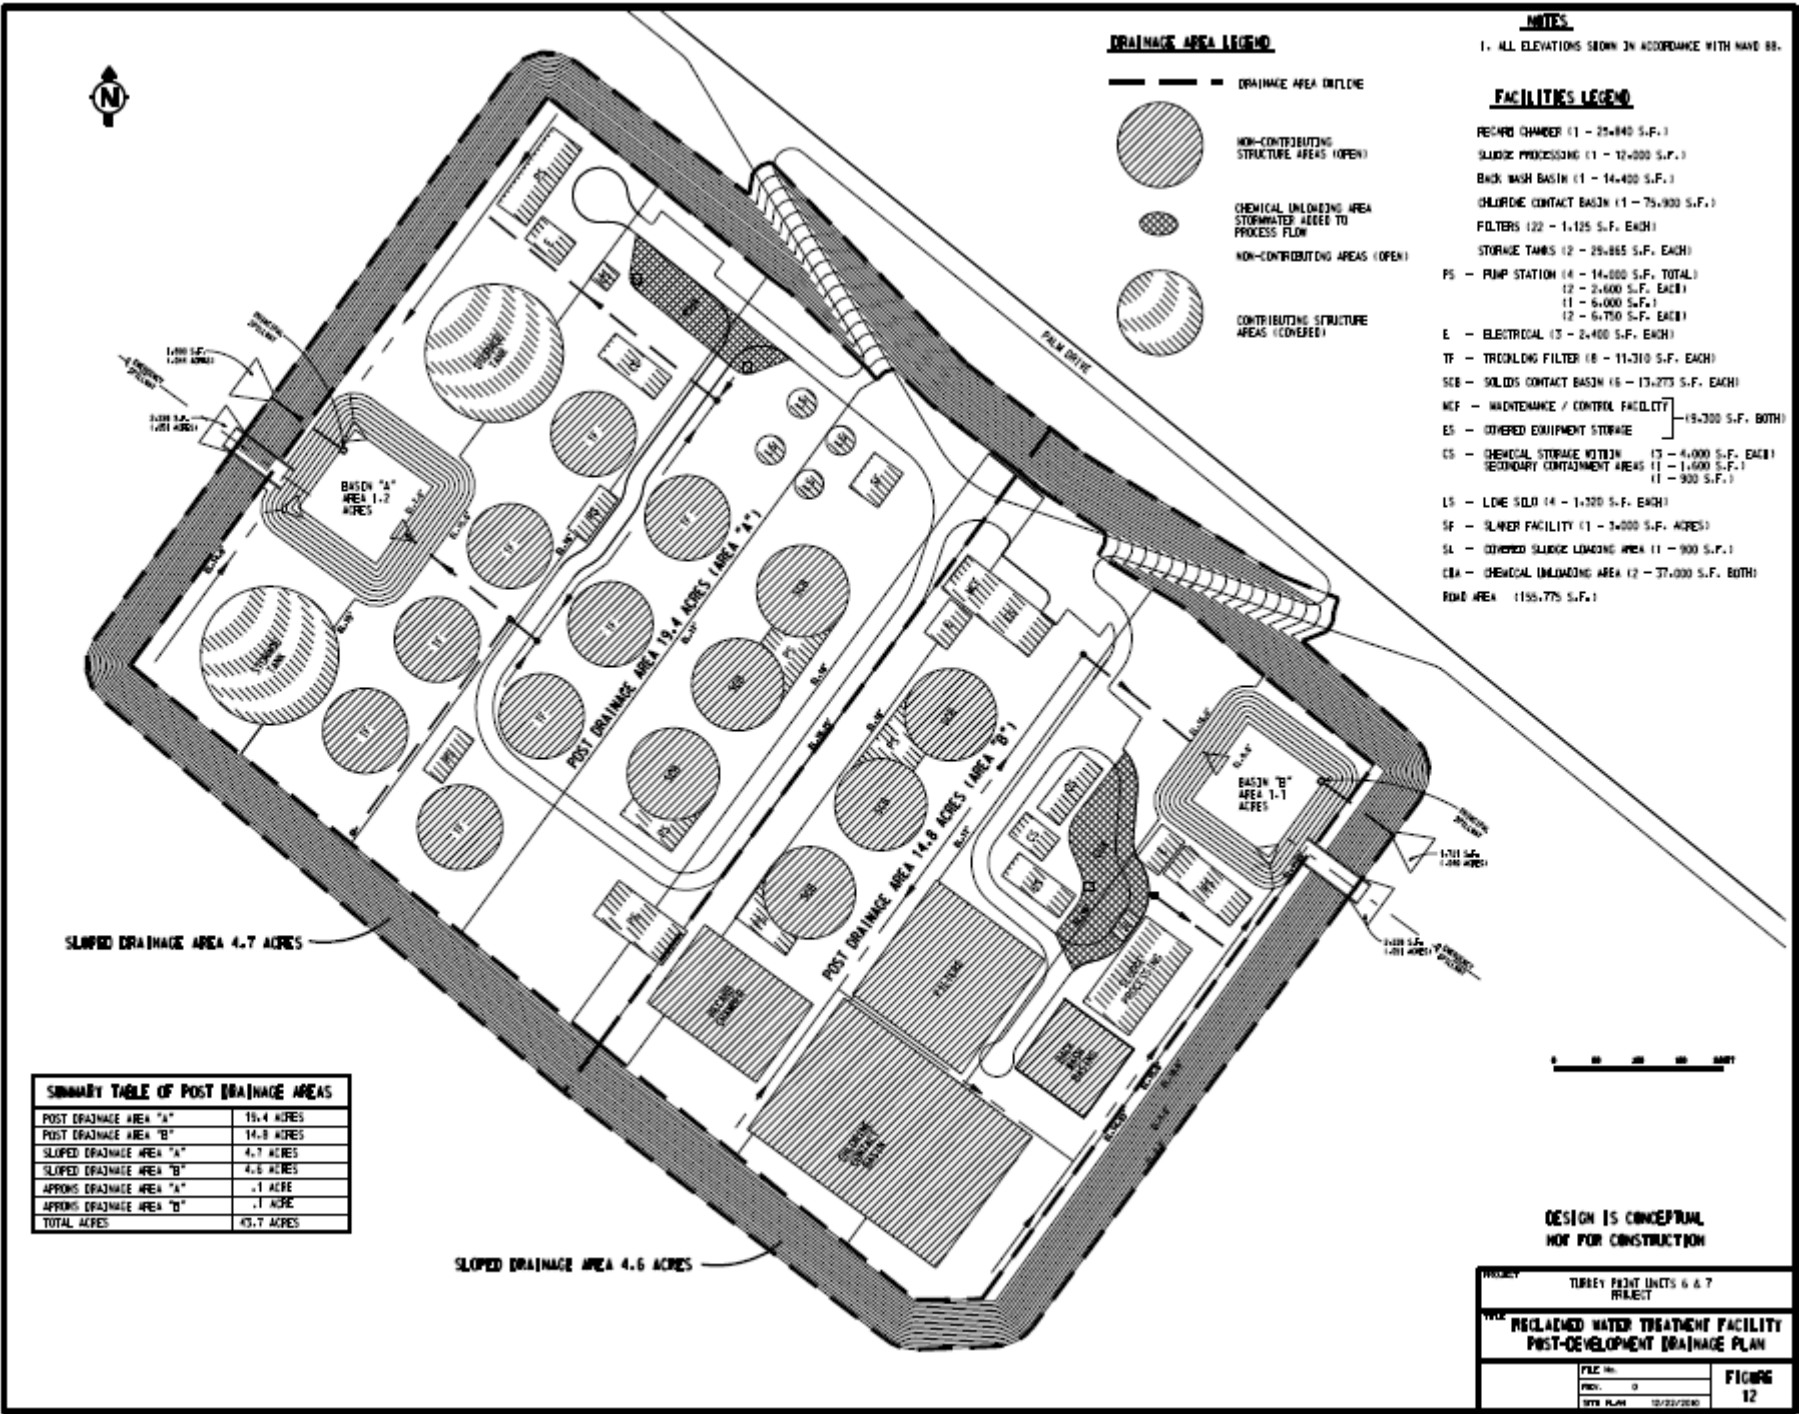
Turkey Point Unit 6 & 7 Reclaimed Water Treatment Facility Post-development Drainage Plan
